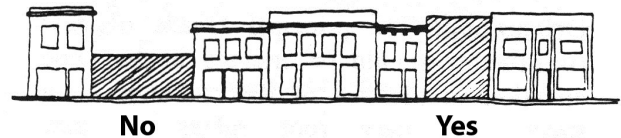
New construction in the commercial district should be of a similar scale to the surrounding buildings. Most commercial structures in Elkton are between 3 or 4 stories.
